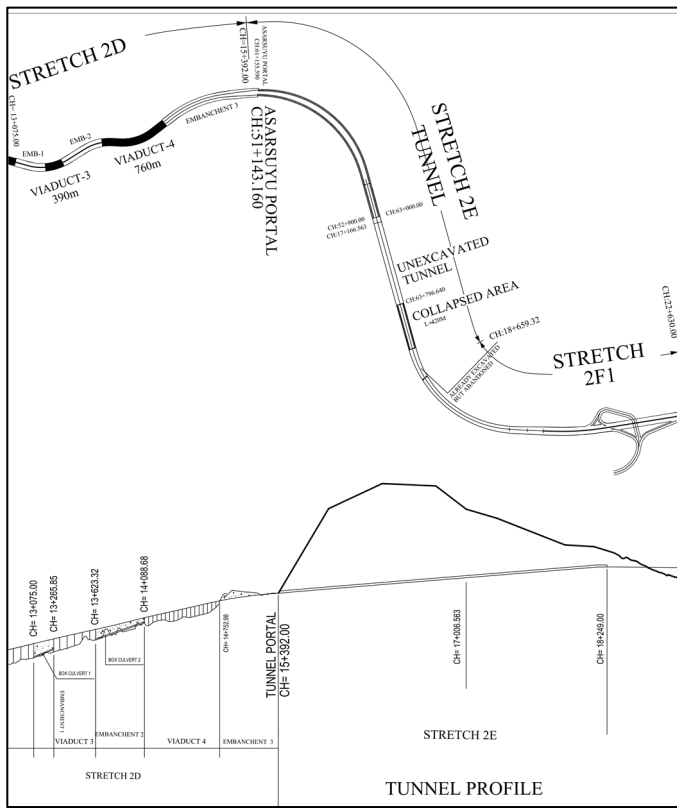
Project layout (plan and profile) and location of Bolu Tunnels.
